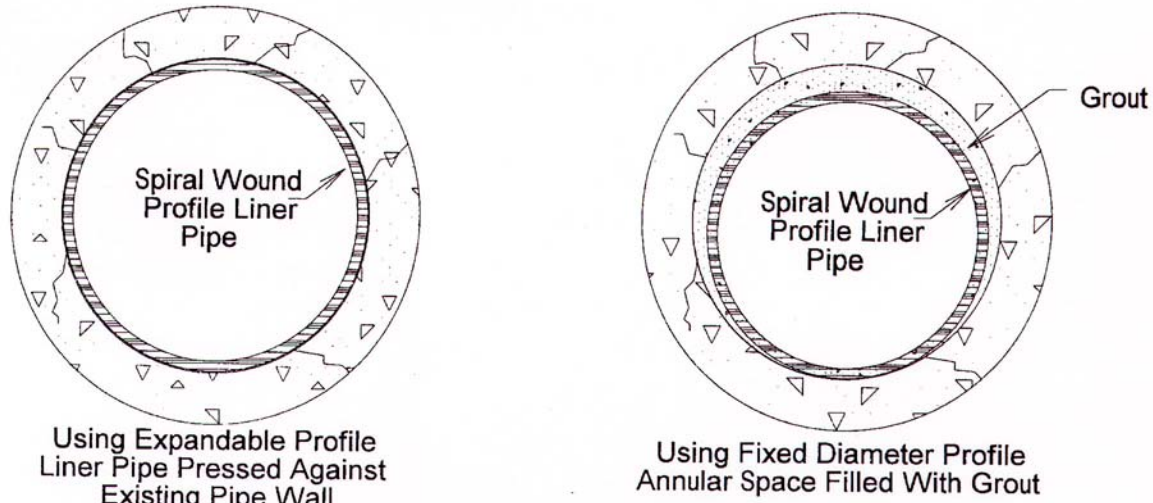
Drawings. Inserted Expandable and Fixed Diameter Spirally Wound Lining.⁽⁶⁴⁾
